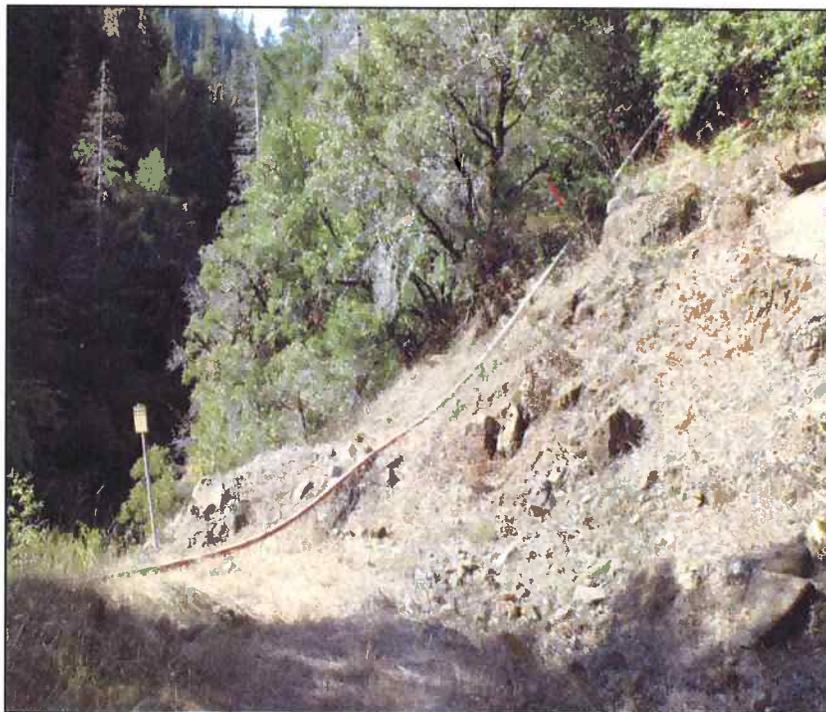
Facing west looking at PVC pipe running from hillside on the north end of Rock Creek Bridge.
